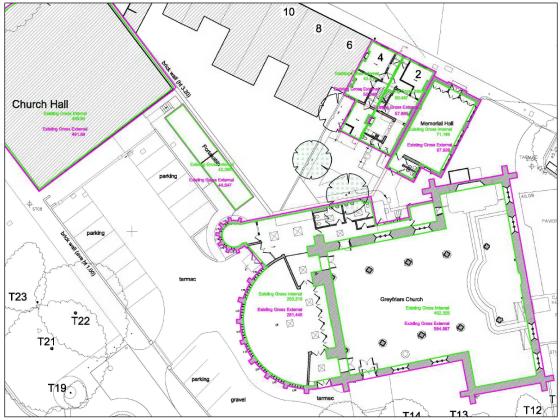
Existing Ground floor plans (Greyfriars Church and Sackville Street)
